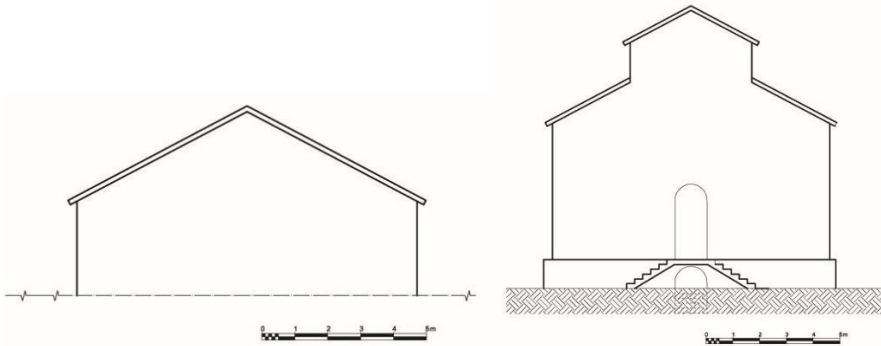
Roof restitution proposal I (west elevation) (Author - 2021)
